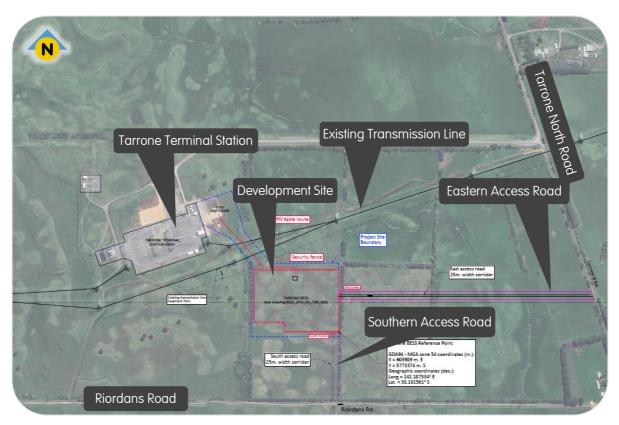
Proposed Tarrone BESS Facility - Site Plan
